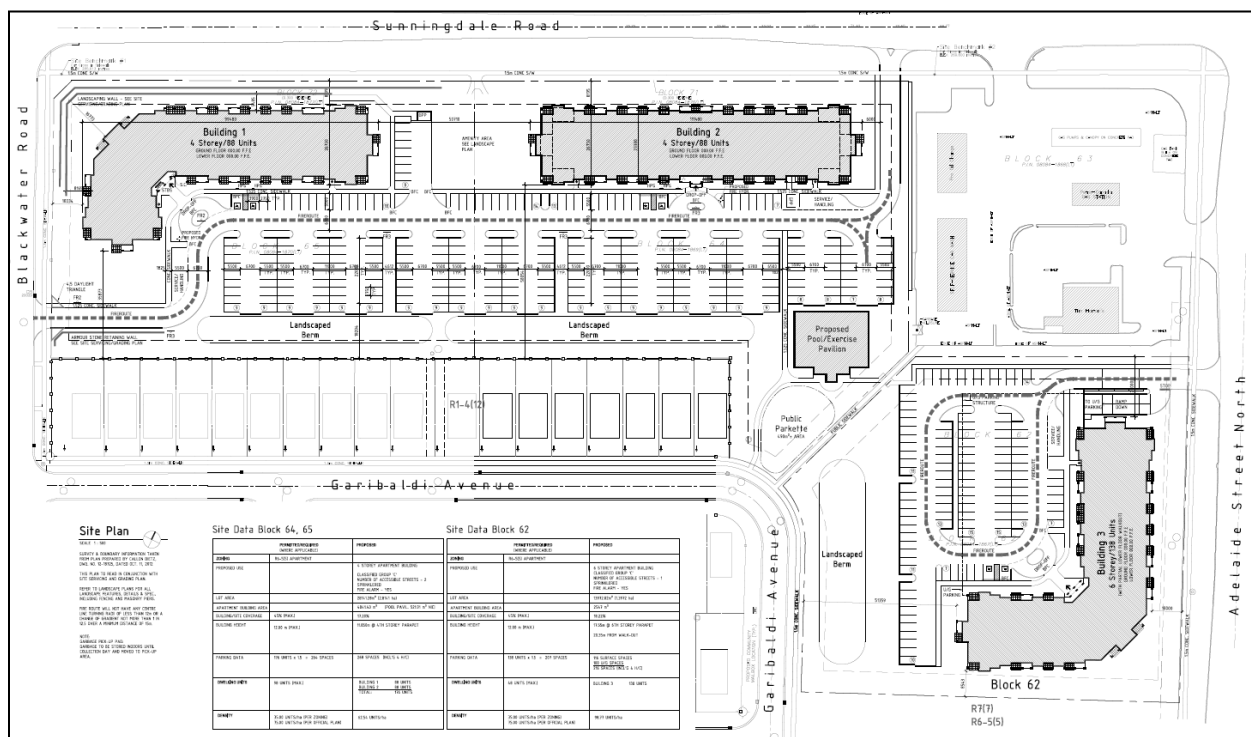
Revised Conceptual Site Plan “A1.10” proposed for subject lands.
